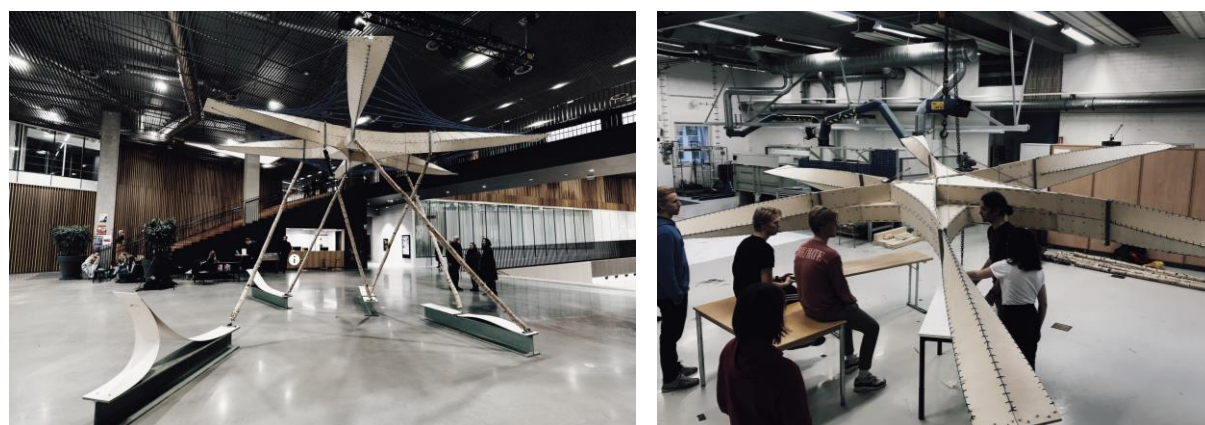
(a) Zero Gravity Kinematic Pavilion, a full-scale prototype, (b) roof of the pavilion
